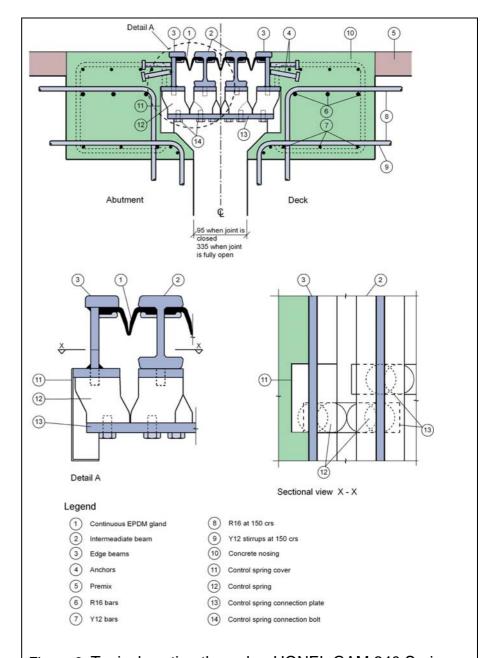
Typical section through a HONEL GAM 240 Series Multi-Element bridge deck expansion joint showing control springs
